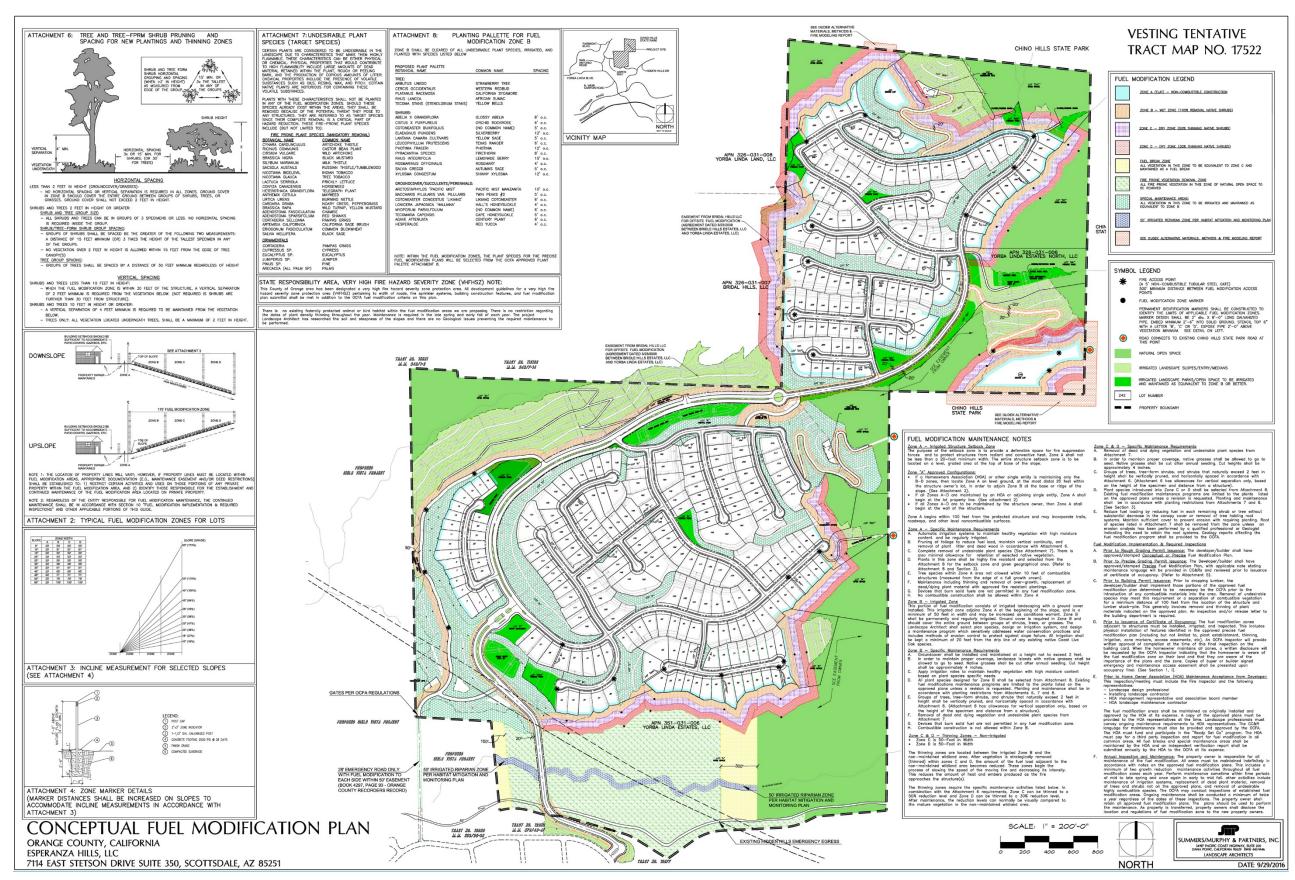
Exhibit 14 - Conceptual Fuel Modification Plan, San Antonio Road Access Configuration
